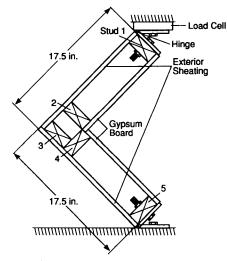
Apparatus used to test the exterior-wall-to-exterior-wall connection.
